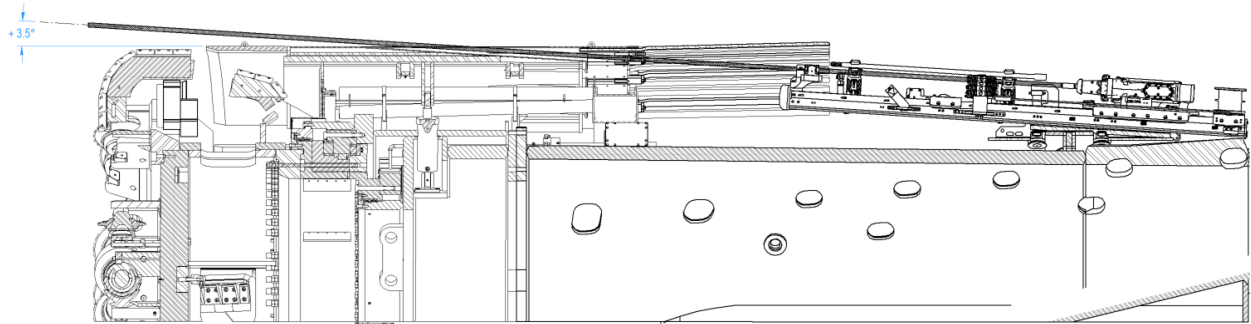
+3.5° Probe Tilt Angle Through Cutterhead Support on JB2
